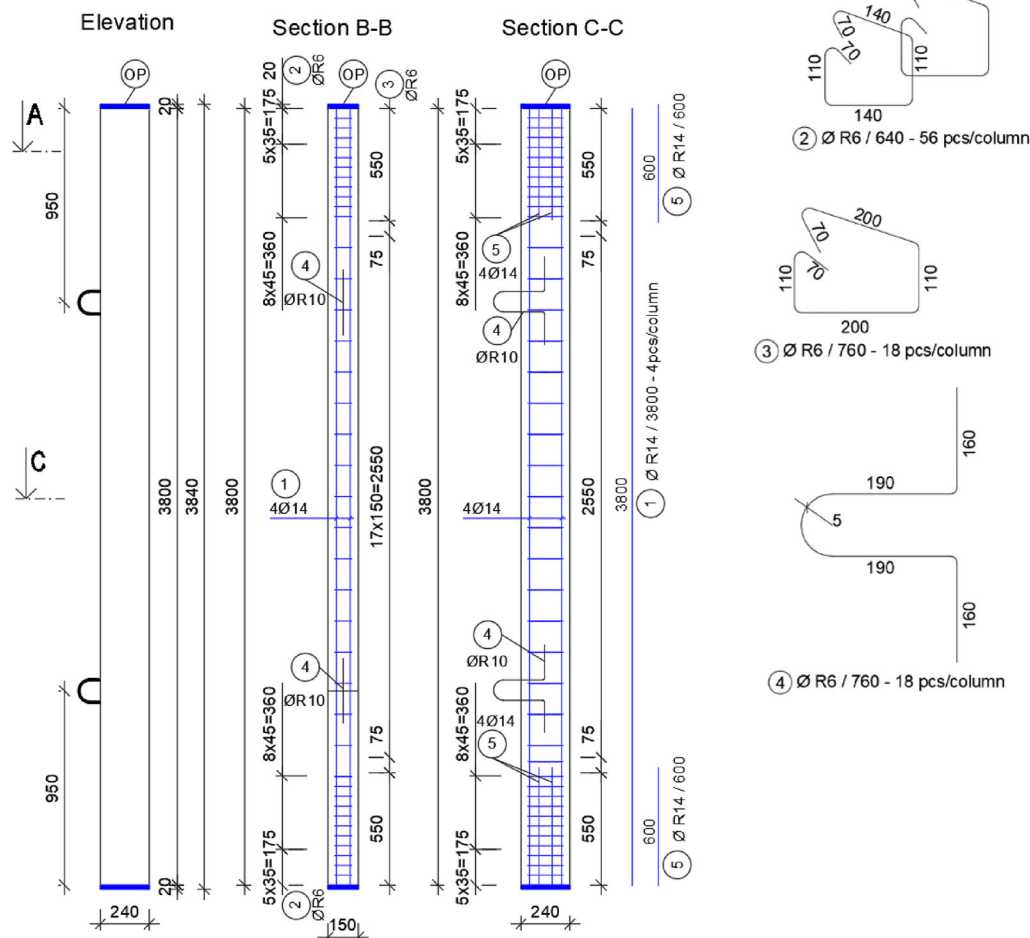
Reinforcement and formwork plans of the investigated slender columns
